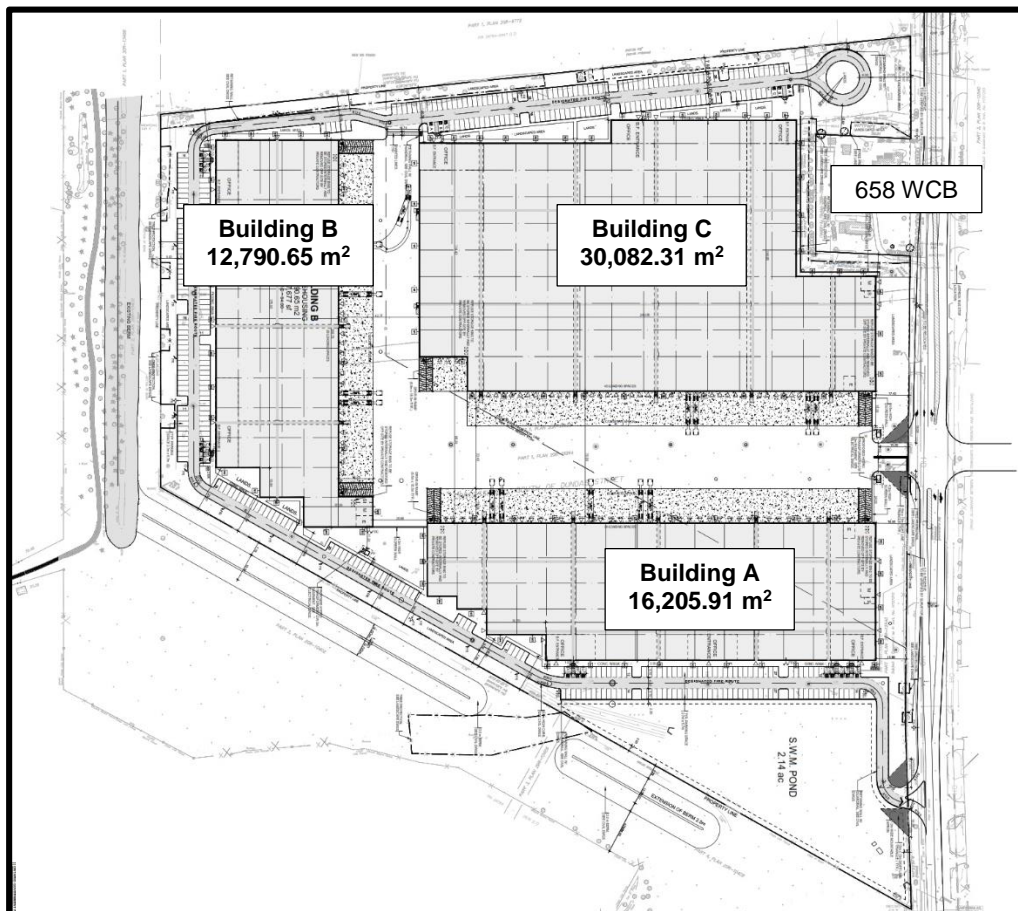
560, 570, and 580 Winston Churchill Site Plan (Dec 2022)
